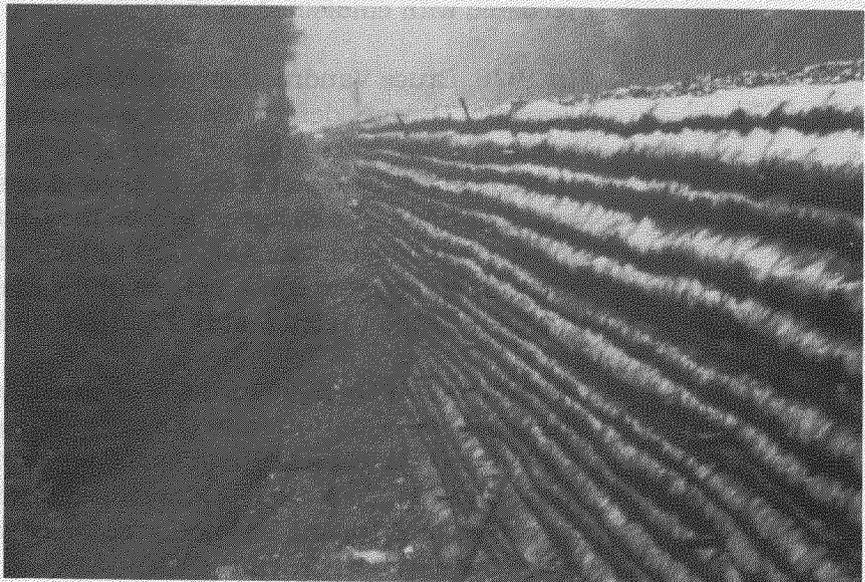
shows the second geotextile reinforced wall, built in 1975 near Shelton, Washington. This wall, 176 feet long by 19 feet high, was fully instrumented for internal and external movement. Nonwoven, needle-punched polyester and polypropylene geotextiles were used to compare their strength and elongation characteristics. There was much concern at the time about the potential for long-term creep in geotextiles under constant tensile load. Less than 1 inch of horizontal or vertical movement was measured in the wall during the first 6 months after construction. Monitoring over the next 3 years indicated no further movement within the wall (Mohney and Steward, 1977).
